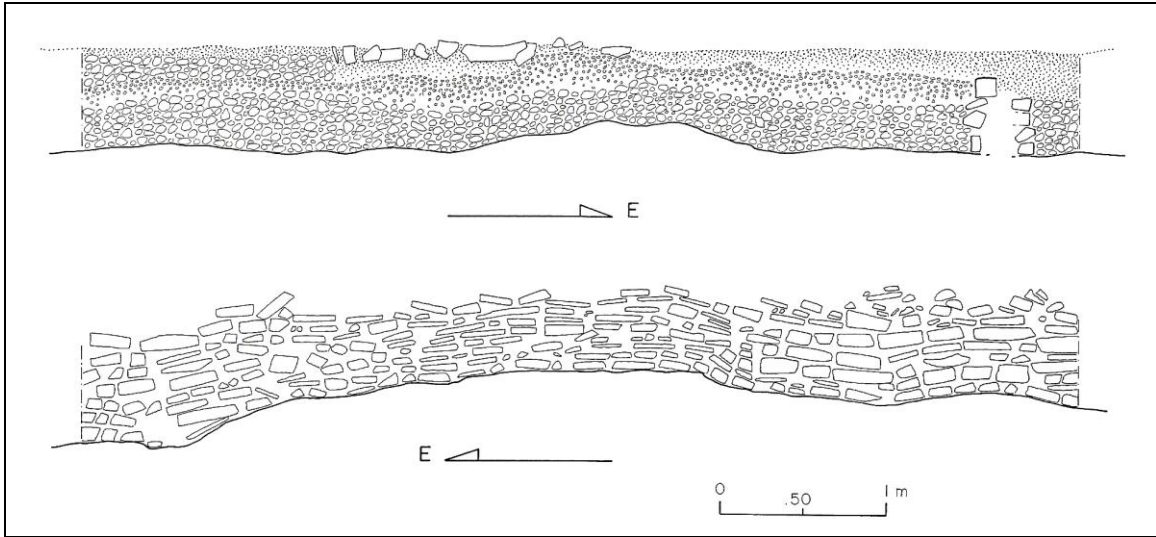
South (above) and North (below) elevations of southern retention wall
